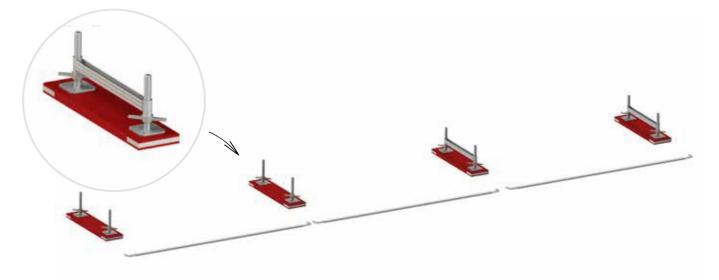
Installation of screw jacks, starting beams and lower braces.
